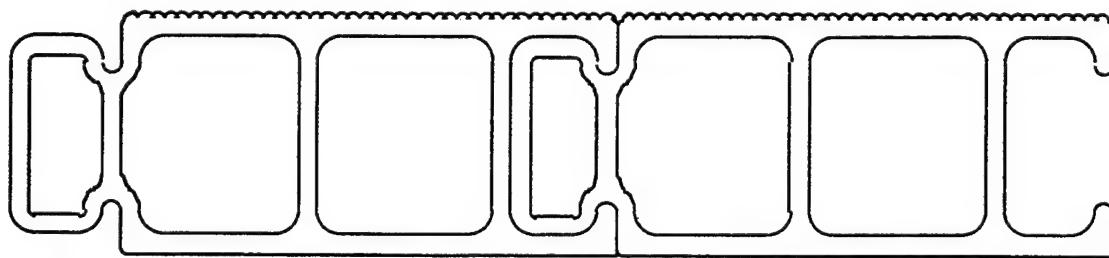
Deck Panels May be Assembled from Interlocking Extruded Sections
